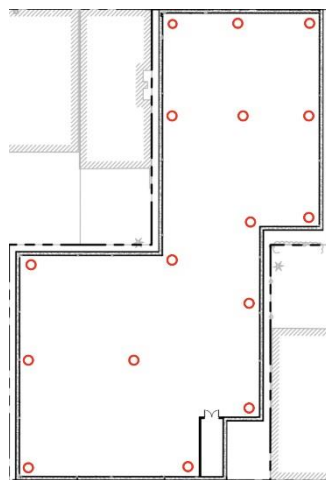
Shown in red circles are the proposed locations for all 16 roof drains
